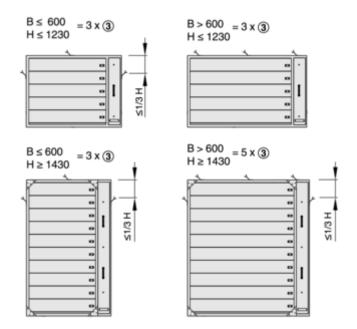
EK-JZ mortar-based installation with wall fixing tabs
